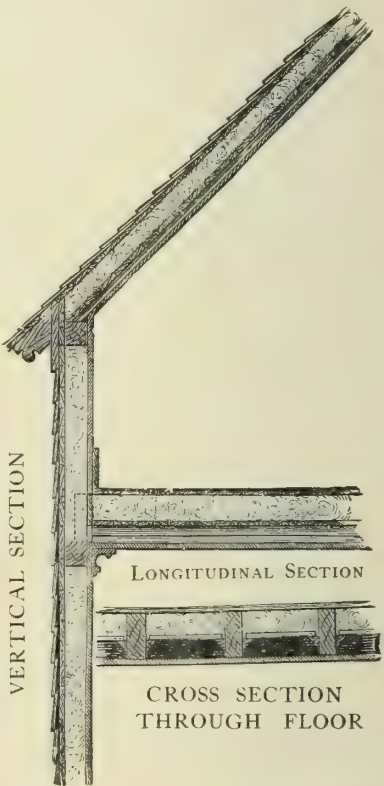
Semi-Fireproof Construction for Walls, Floors and Roofs
